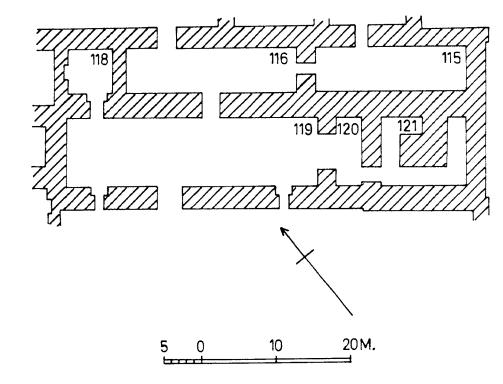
Plan of the Throne Room Suite of Residence L at Khorsabad
